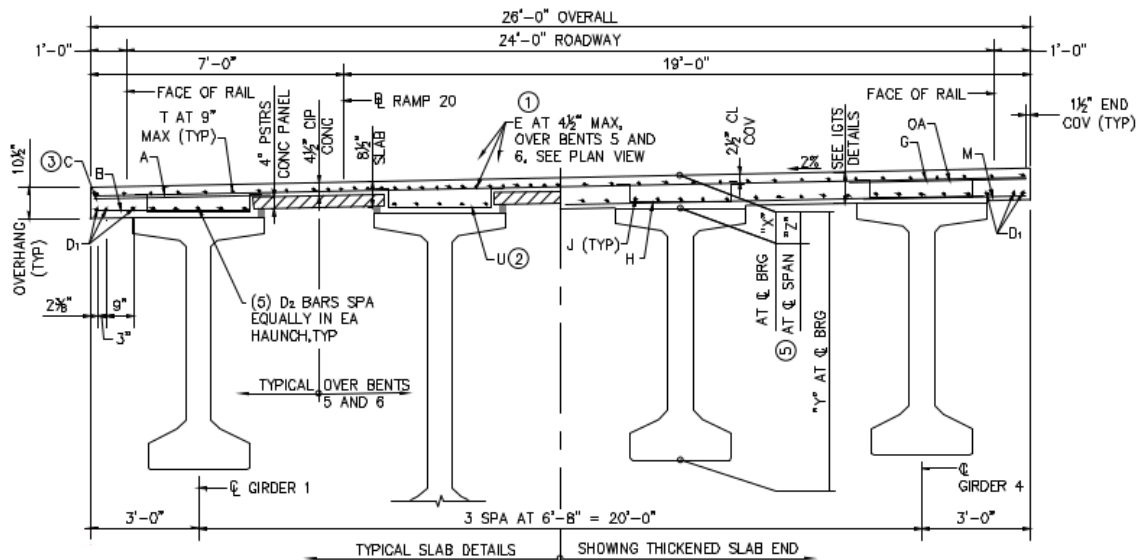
IH 35 UPRR Ramp Section View Drawing (TxDOT)
